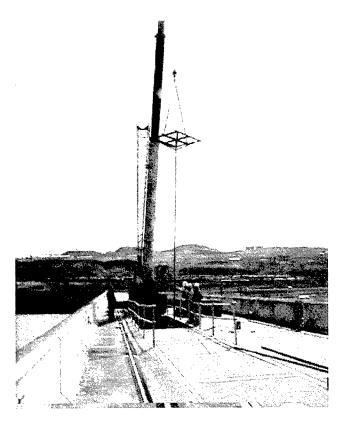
Photograph of a pipe mount being deployed through the deck-plate opening in The Dalles spillway
